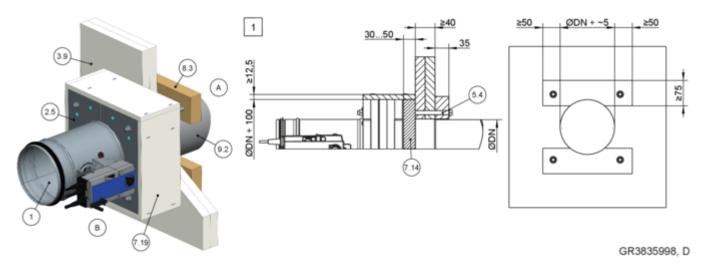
Dry mortarless installation into a shaft wall without metal support structure, with installation kit WA2
